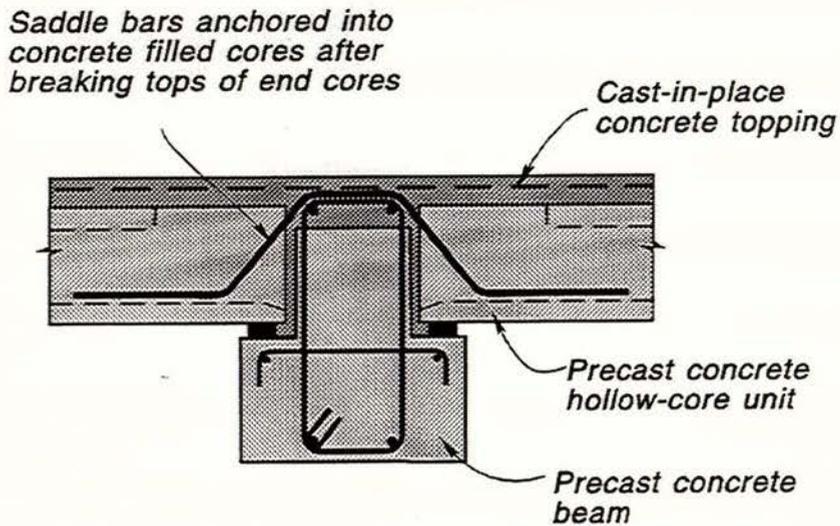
Saddle Bars for Precast Hollow-Core Units According to the New Zealand Guidelines [1]
